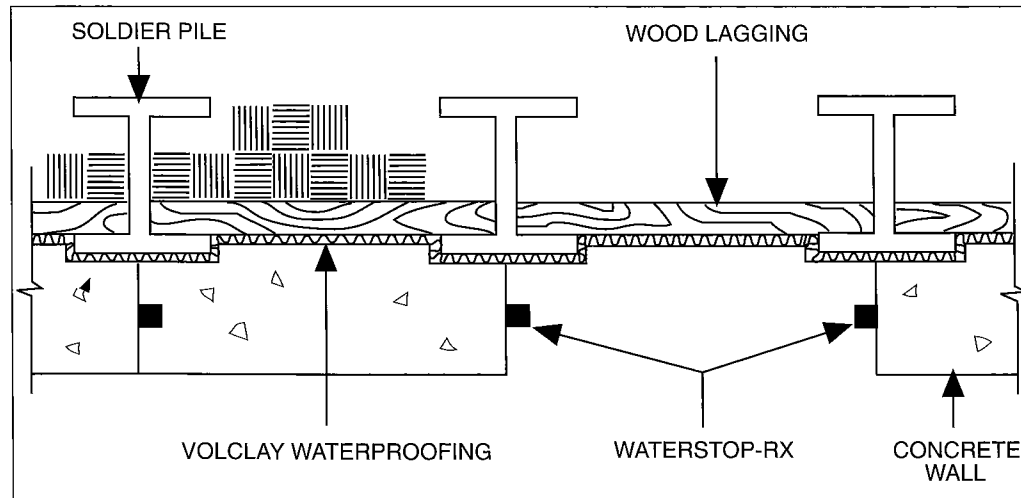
Waterstop-RX installed when wood lagging is positioned adjacent to soldier piles inside flange
